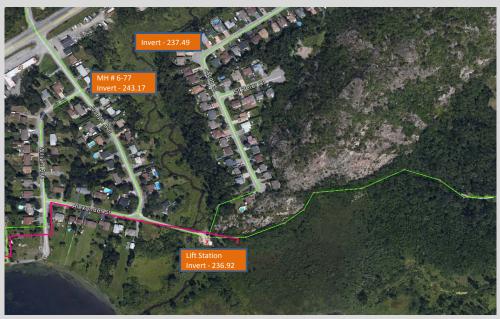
Manhole location, invert, and proposed development locations surrounding Jacob Pumping Station
